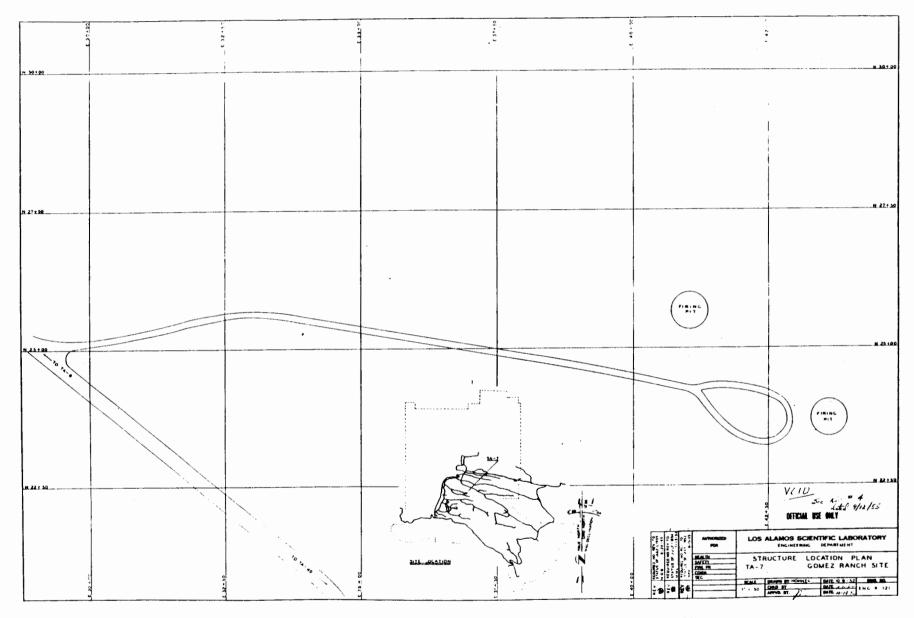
Structure Location Plan for TA-7 - Gomez Ranch Site (1952 Drawing from the LANL Technical Area Structure Location Plans)
